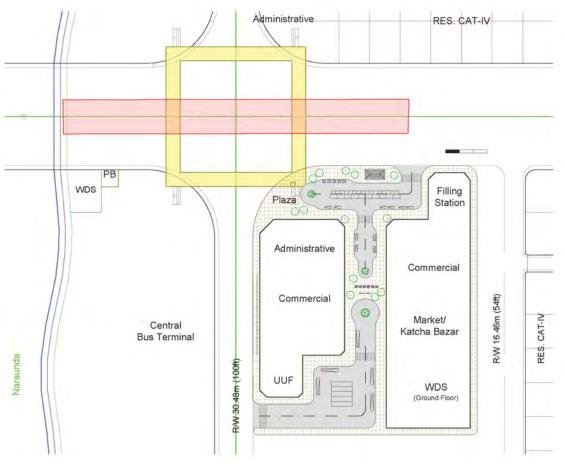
Proposed Station Plaza at Purbachal East Station (Alternative 2)
